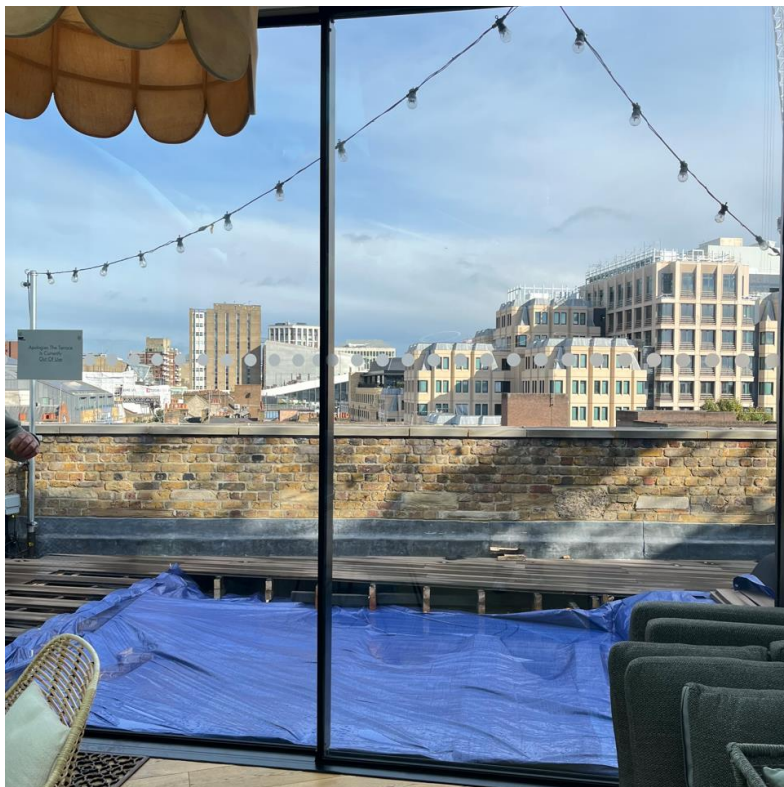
(above): View of roof at 5<sup>th</sup> floor level through proposed new sliding doors
